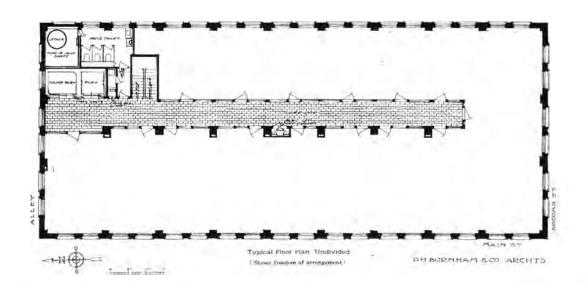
Undivided upper story plan in June 1910 promotional booklet (Putnam Trust collection).
